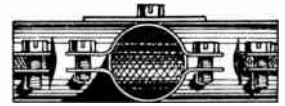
A "GRIP" INSPECTION T FITTING FOR USE WITH PLAIN JOINT CONDUIT.
